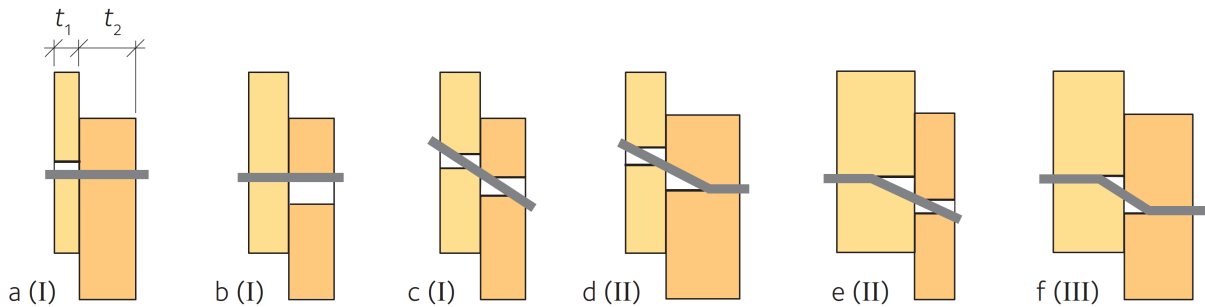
Possible failure modes in timber-to-timber joints [29]
